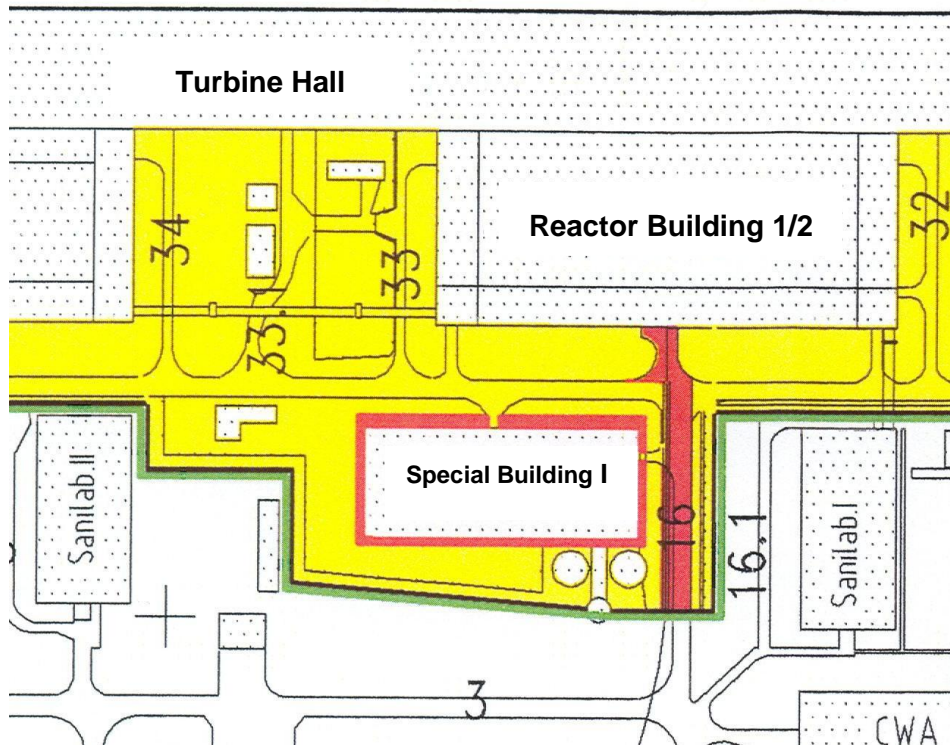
Categorisation of ground at the Greifswald site; extract from site layout plan
